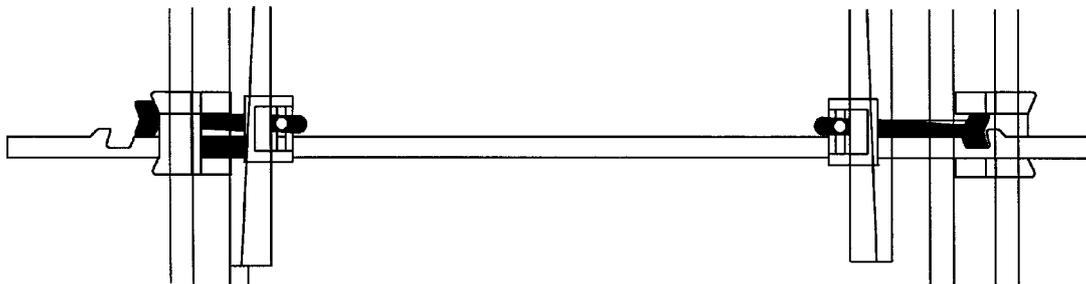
shows an assembled claw lock installation on a tangential turnout.
